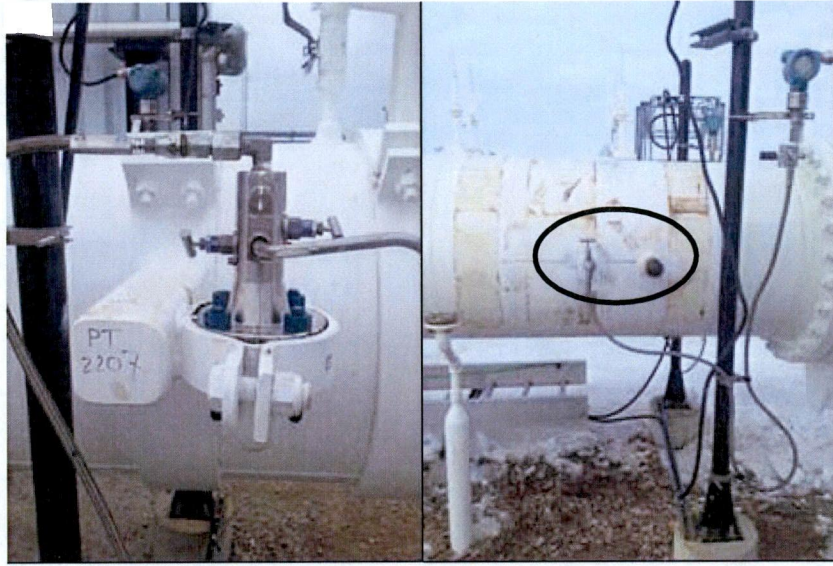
PT-2207 branch connection: original configuration (left) and new root valve (right).
